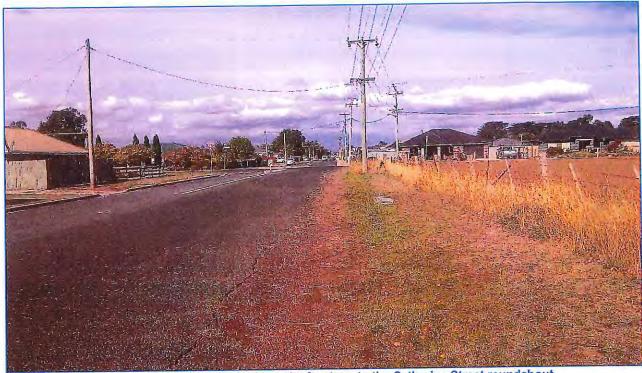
Looking east along Bulwer Street from site frontage to the Catherine Street roundabout.
